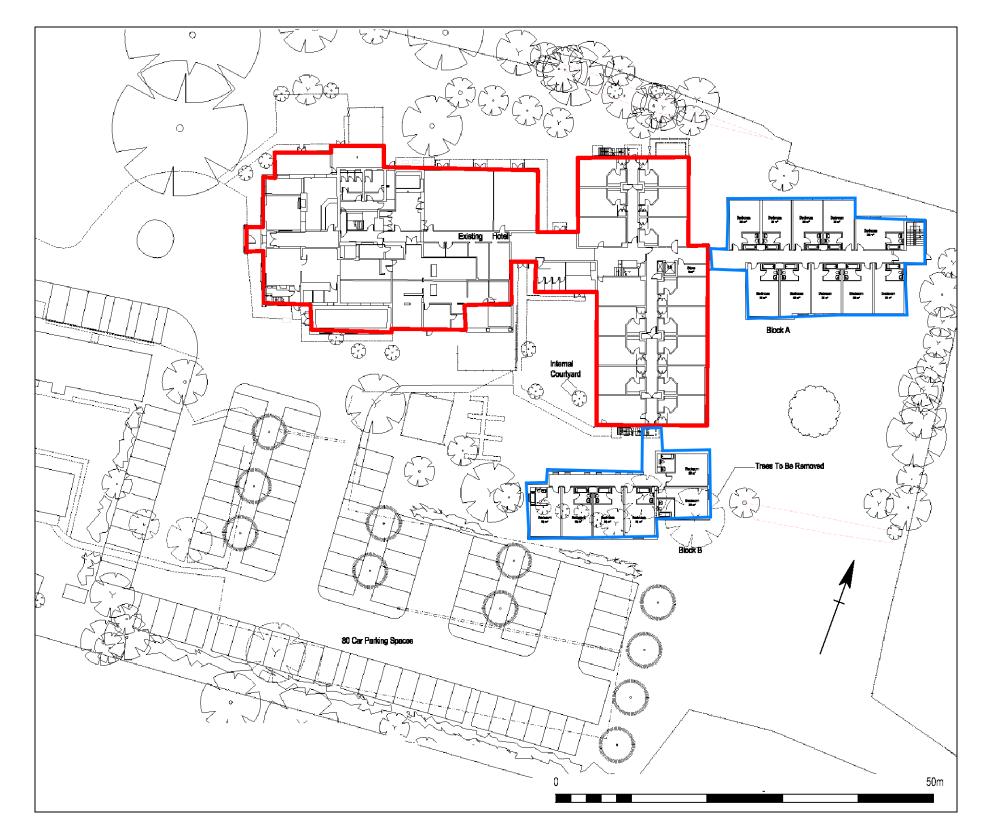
Proposed development outlined in blue, existing buildings outlined in red. (Scale 1:500)
